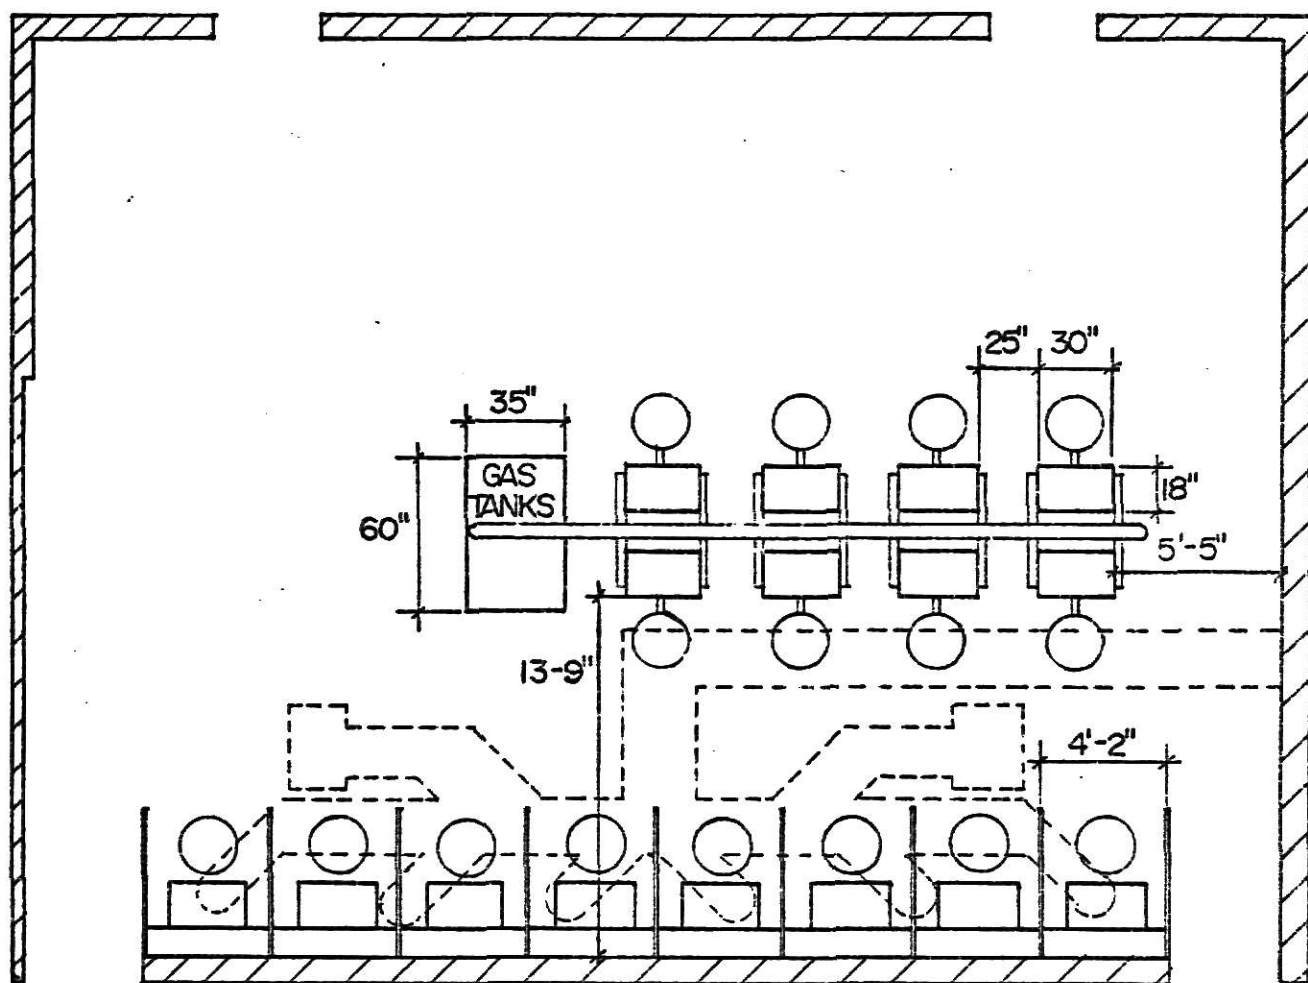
FLOOR PLAN OF THE WELDING LAB.
